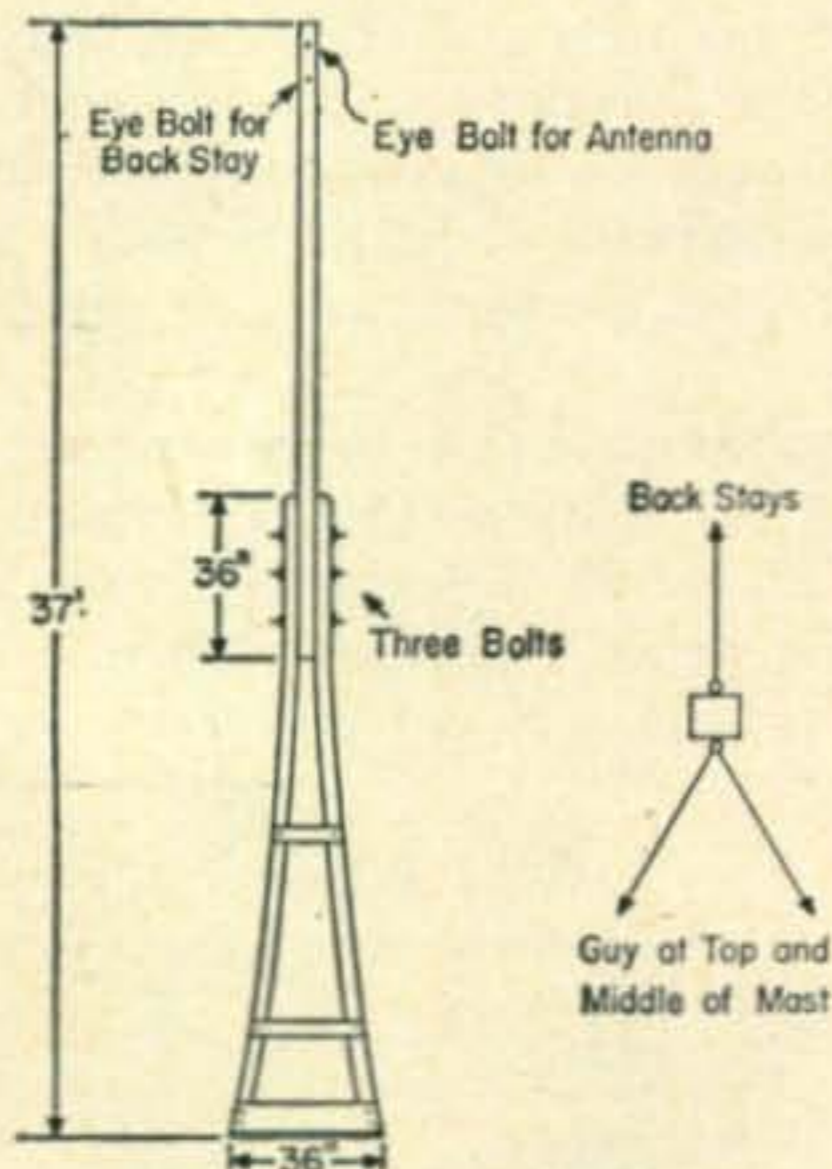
Mast construction details. Galvanized nails must be used for securing the wood braces.
